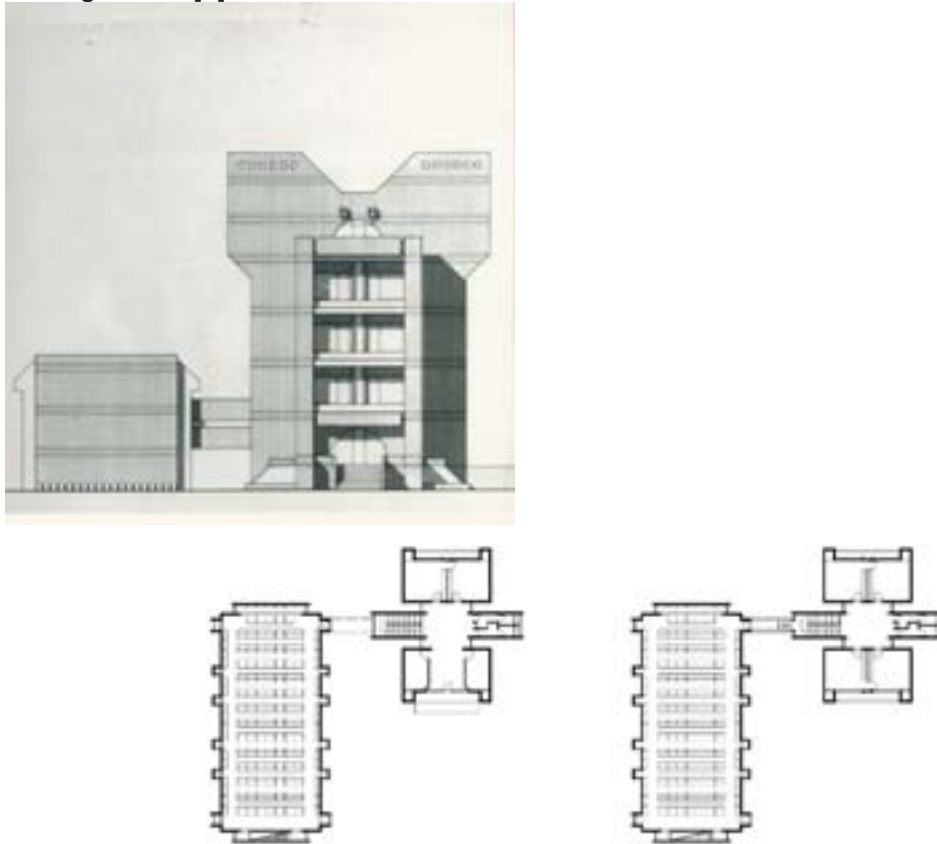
Georgi Konstantinovski (1972-1976). Archive of Shtip: South elevation, Ground floor plan, First floor plan.
